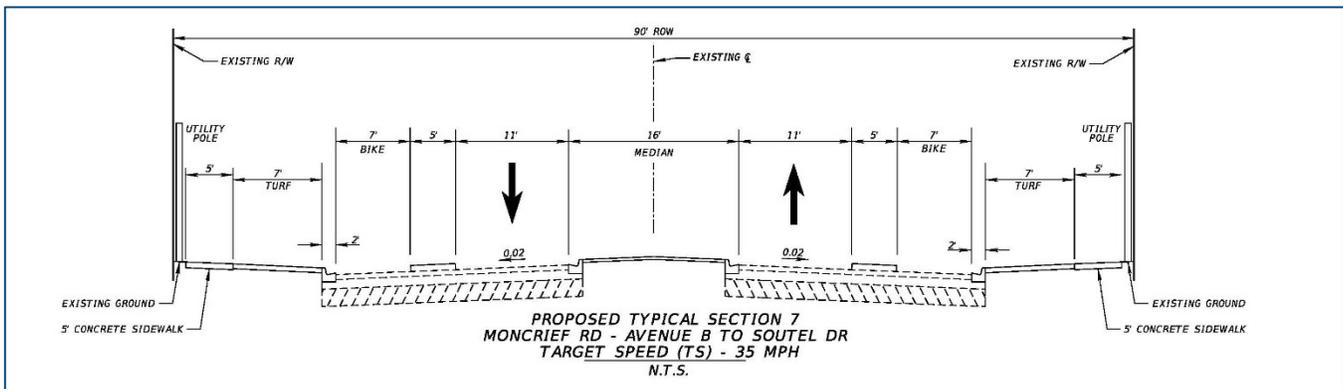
Proposed Typical Section (Avenue B to Soutel Drive)
